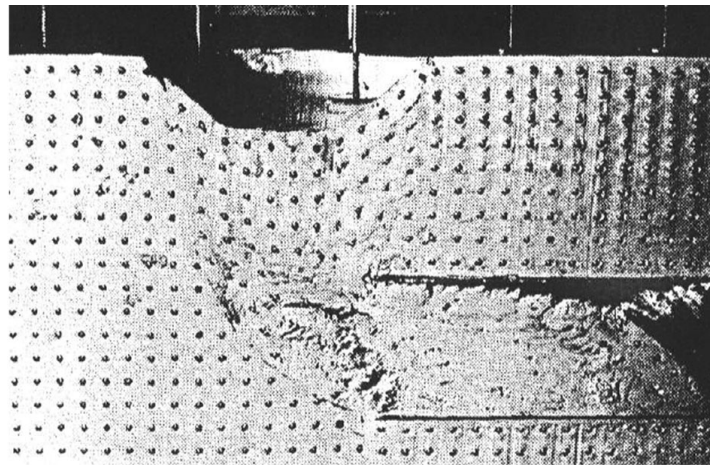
Tunnel face collapse in undrained clays, Schofield (1980)
